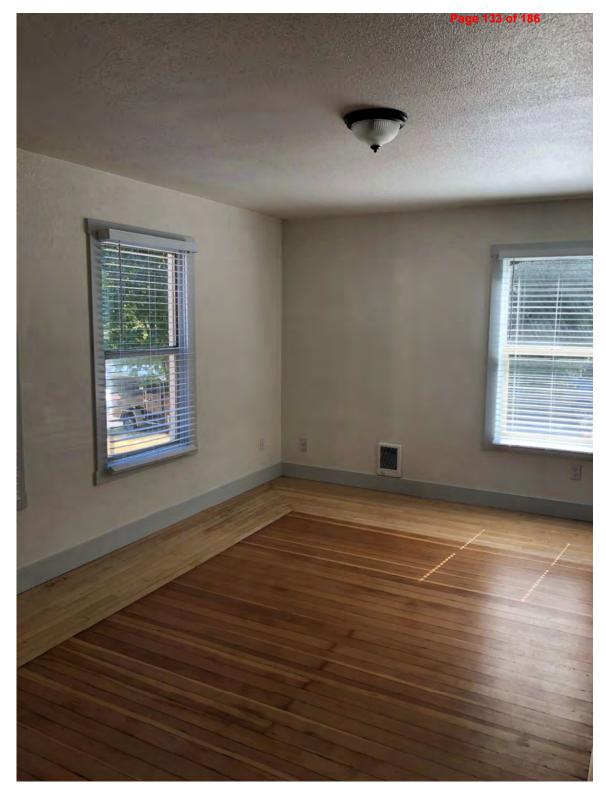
(After). Newton Apartments, Typical First Floor unit, former Unit 8, original oak/fir flooring, looking southeast. August 2020. Source: Stephen Day Architecture.
